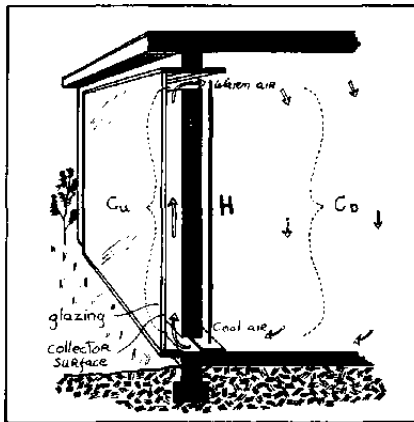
A convective loop wall-mounted collector (MOR-1).
